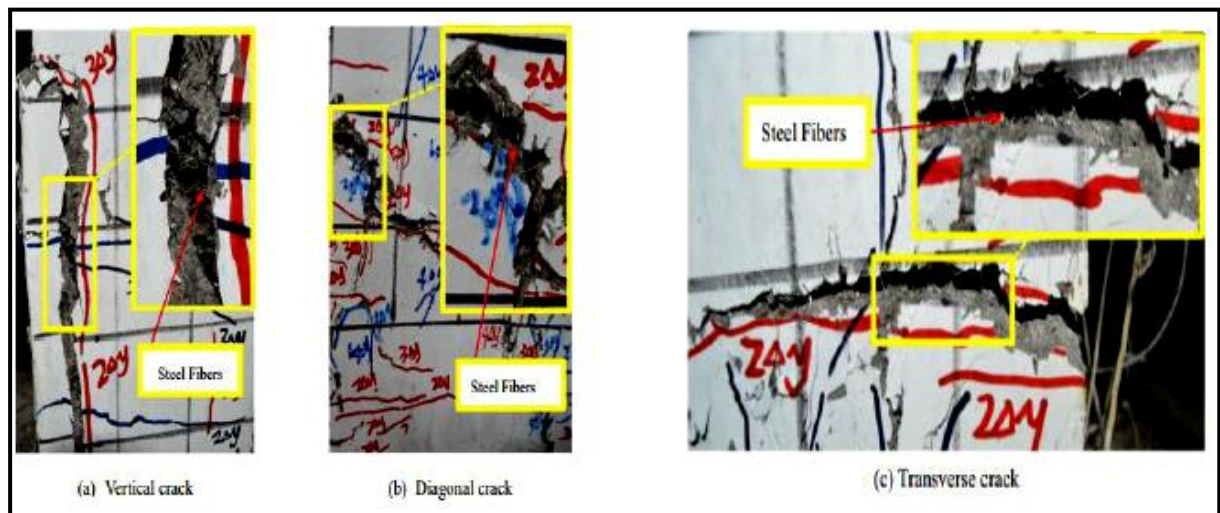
Steel Fiber Holding the Cracked Concrete (Xu et al. 2017)
